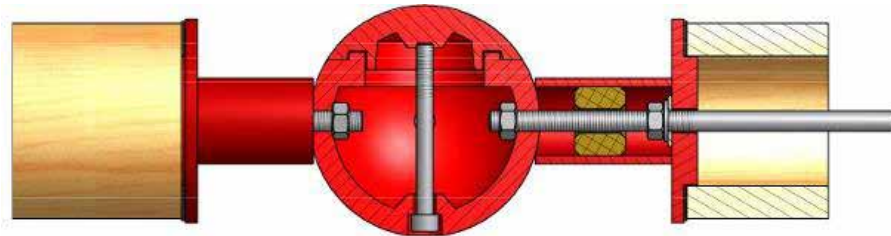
Ring Pass Field Hockey Club, section drawing of a Tuball, 2010
